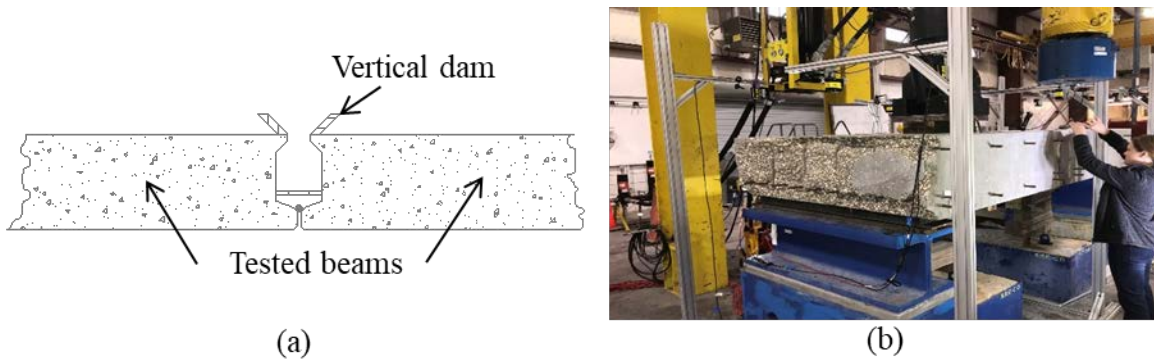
Casting of UHPC joint for second test: (a) vertical dam layout on broken beams and (b) second testing instance for joint geometry
